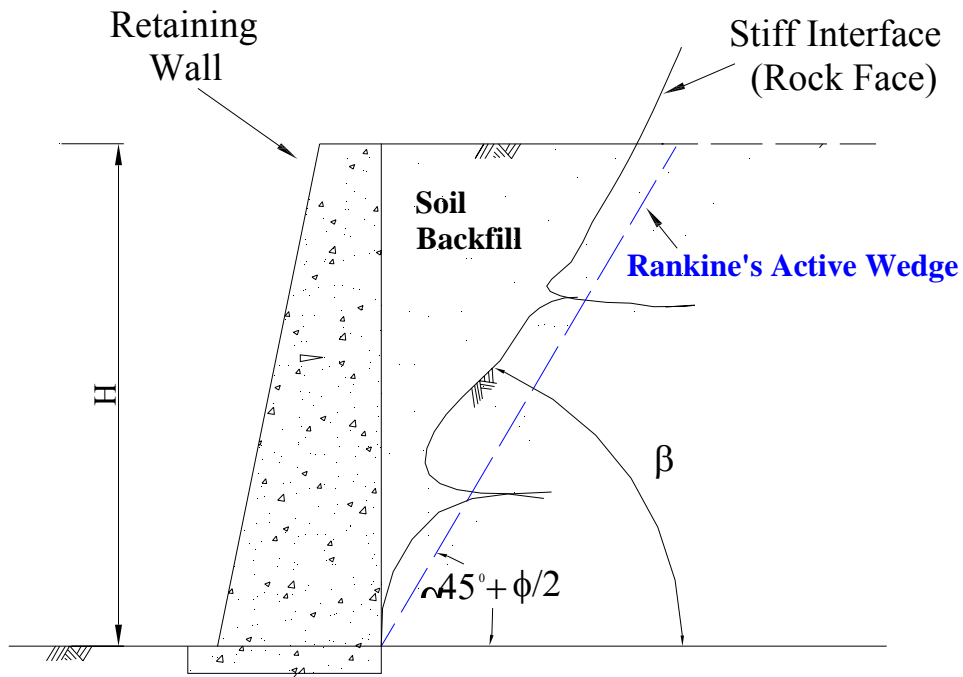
Retaining walls with intrusion of a stiff interface into backfill
